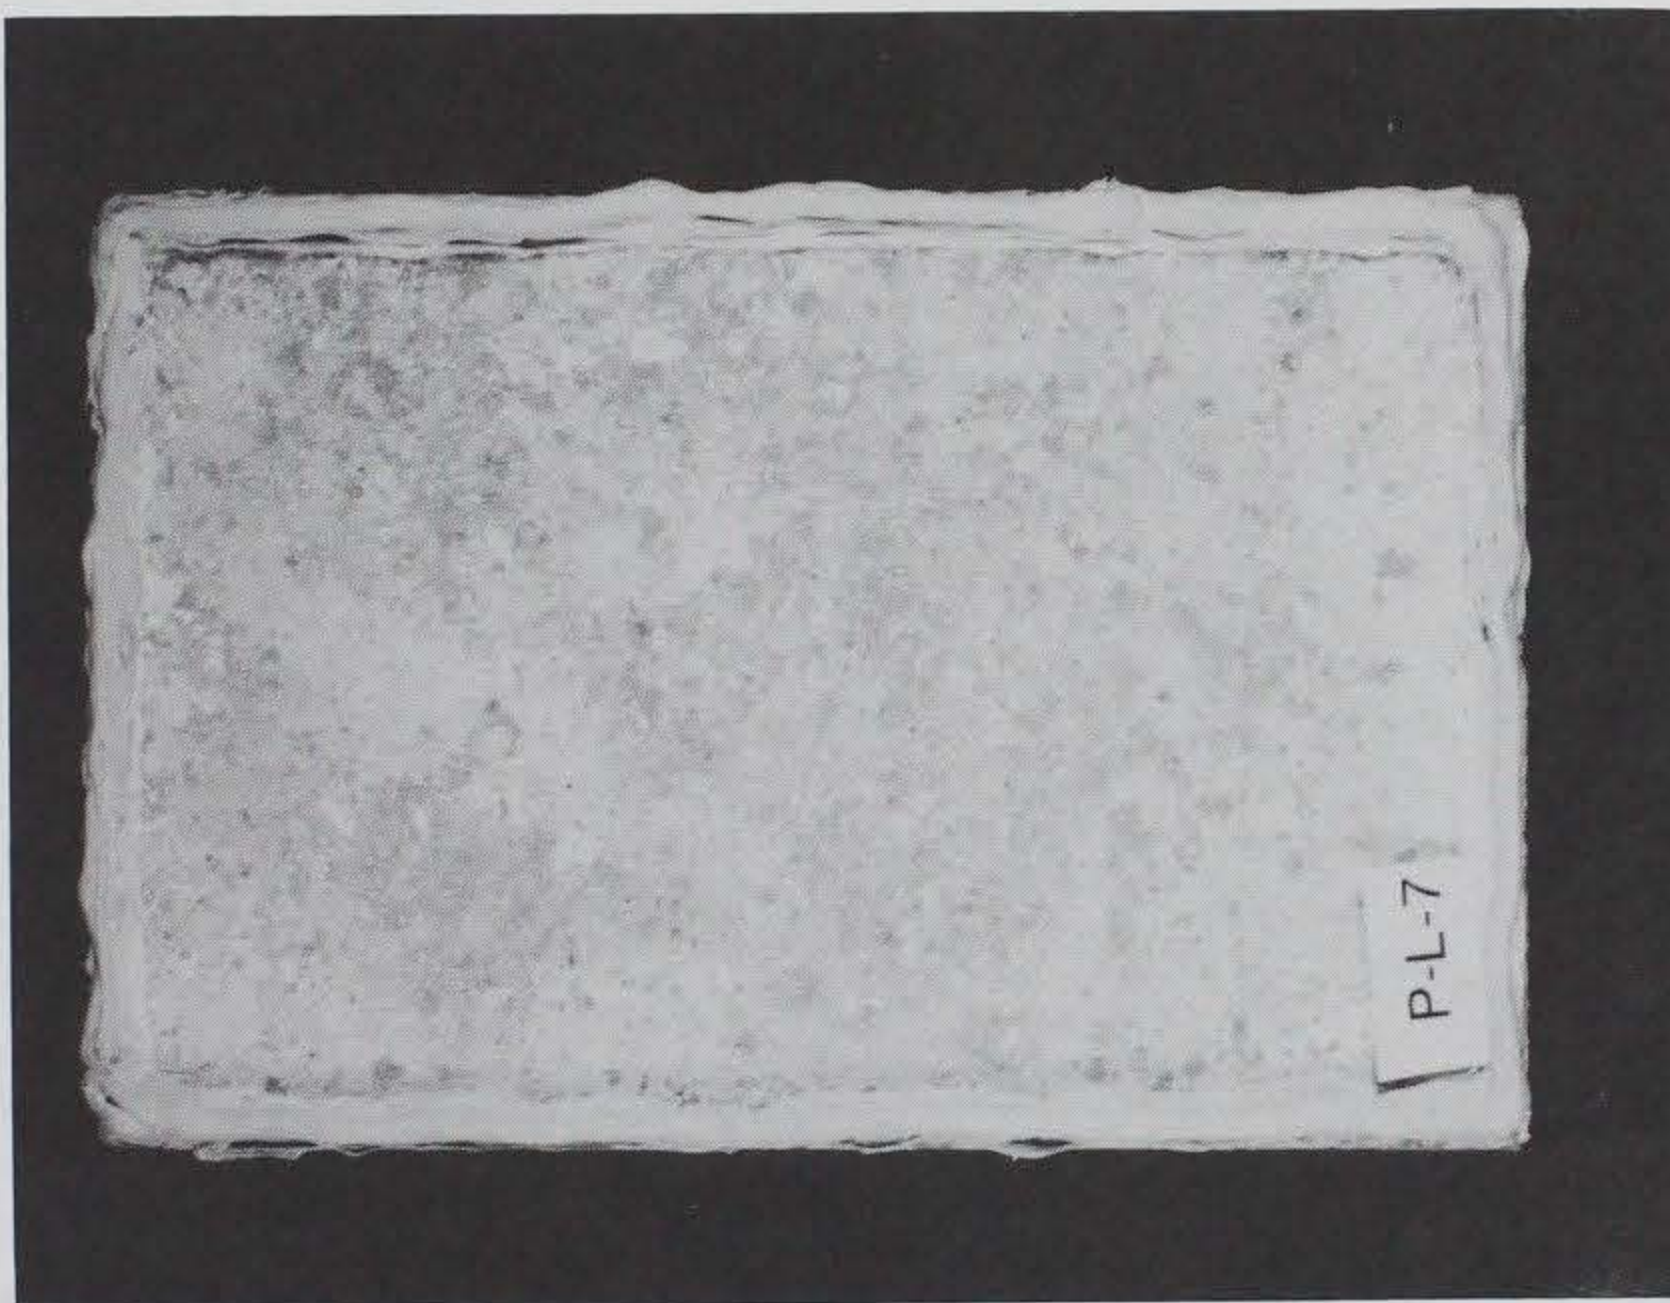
Photo of specimen from mixture L-7 showing the greatest amount of scaling
